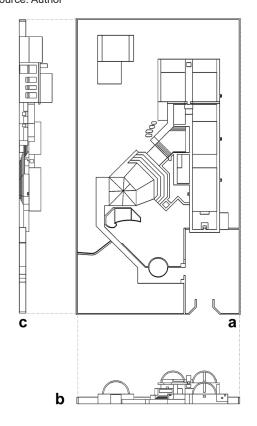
Orthographic drawings of Sangath. a) The roof plan; b) the south (front) elevation; and c) the west (right) elevation Source: Author
